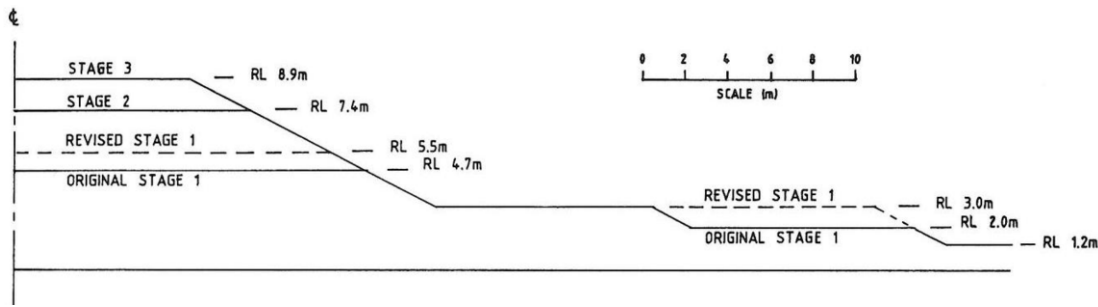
Embankment construction stages –My Thuan Bridge, Vietnam (adapted from Srithar and Ervin (2000)).
